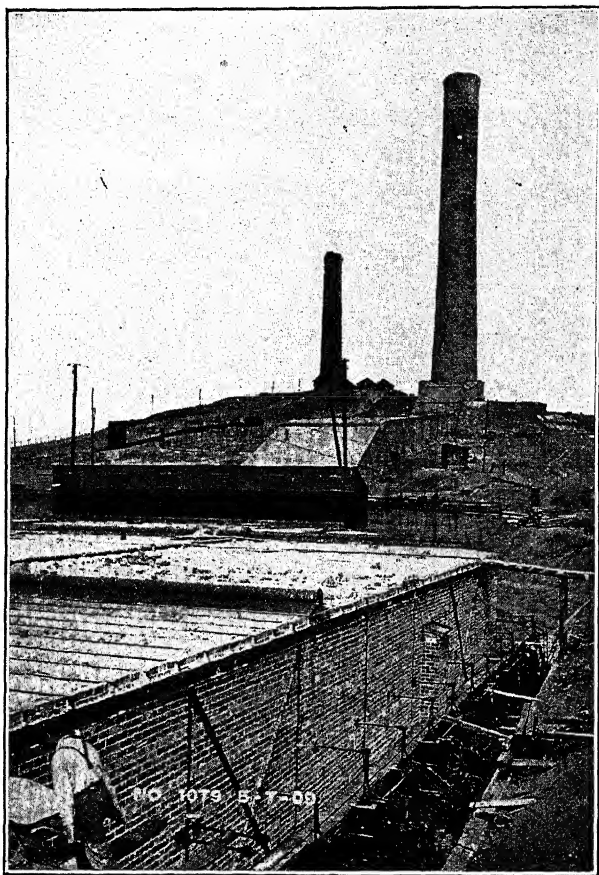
PLATE XXI.—WIRE-SHAKING MACHINERY AND GENERAL VIEW OF FLUE SYSTEM.
